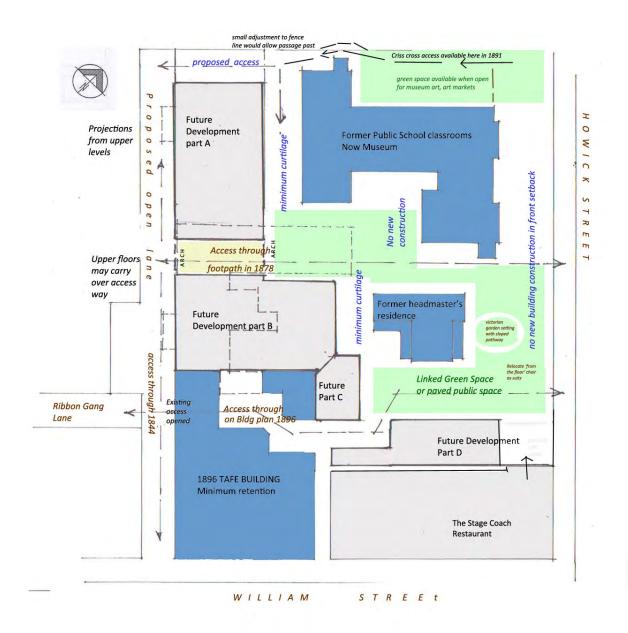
Part 1: TAFE site development plan showing possible building footprints
